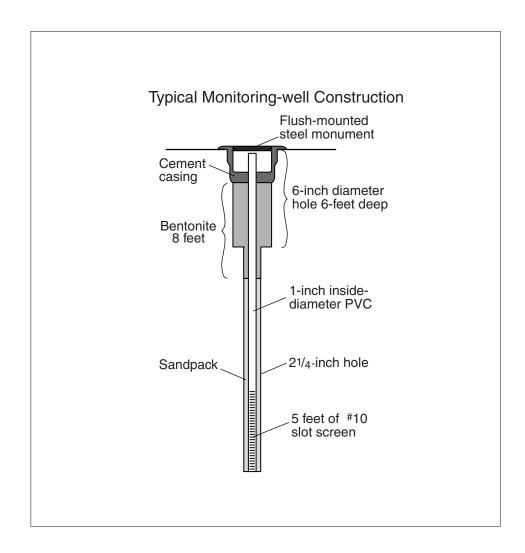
Construction of a typical monitoring well. The well is sealed with bentonite and cement.
